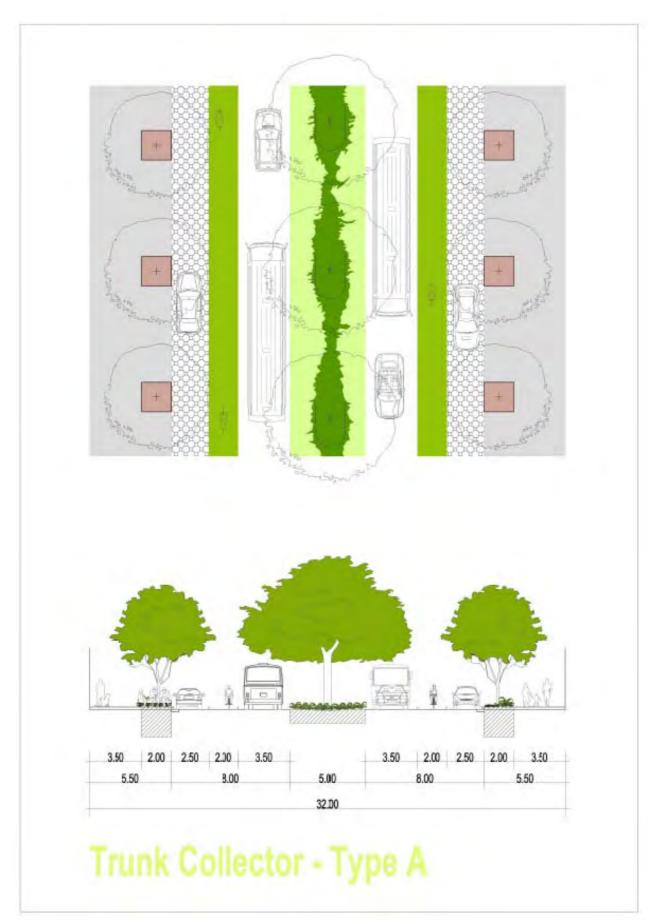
(a) Trunk Collector Road Type A Typical Cross Section
